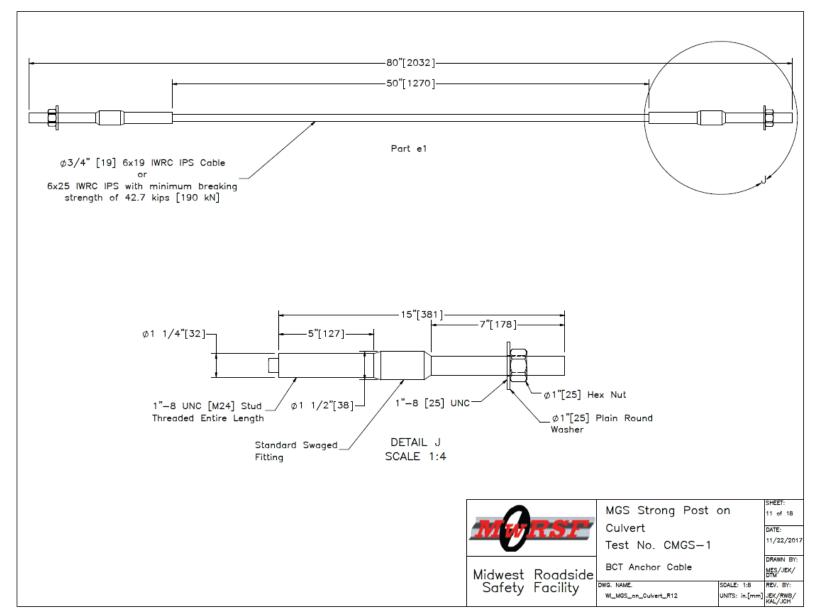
BCT Anchor Cable, Test Nos. CMGS-1 and CMGS-2
